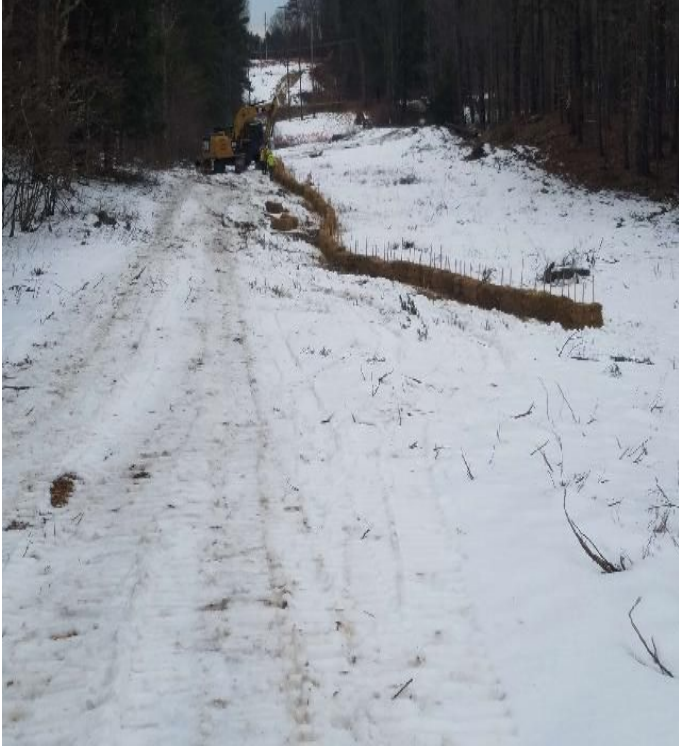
Crew installing BMPS along access road to Str. 61. Viewing west. (02-25-20).
